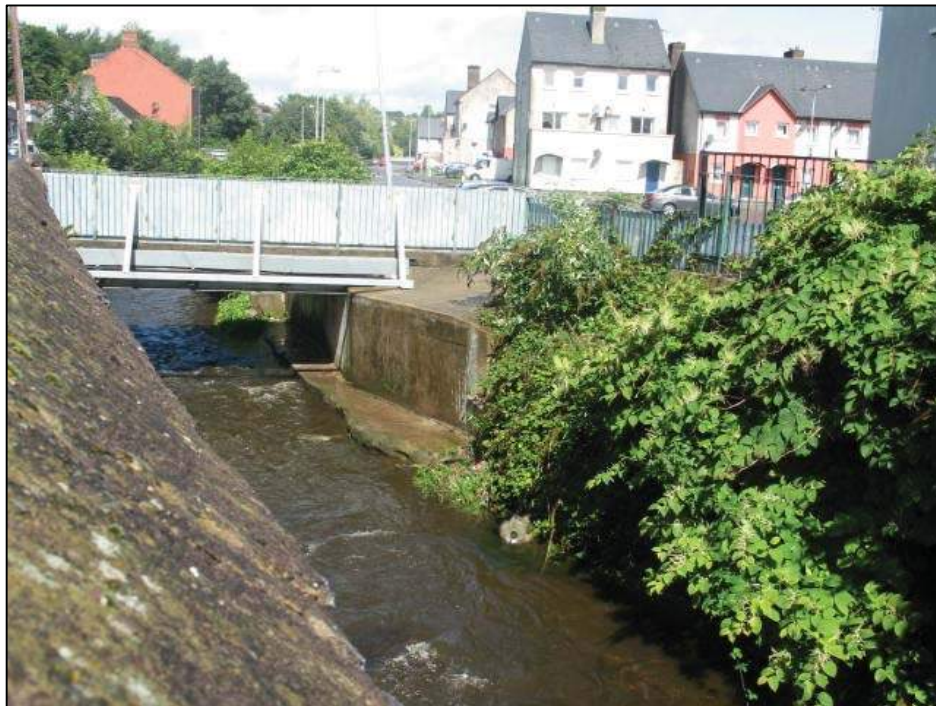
View of River Bride at south end of Orchard Gardens from south
